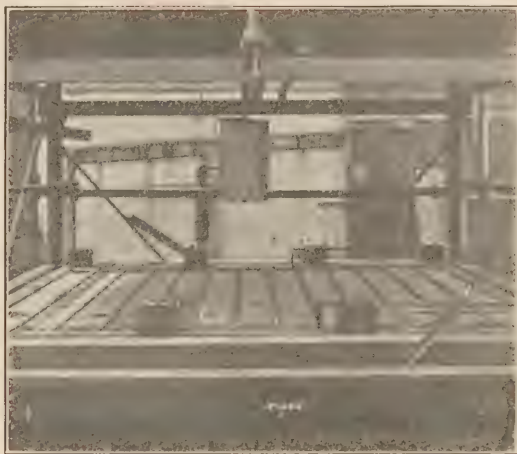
View Looking West, Showing Furring Strips and Deadening Felt after finished floor was removed after Fire and Hose Stream Test.
